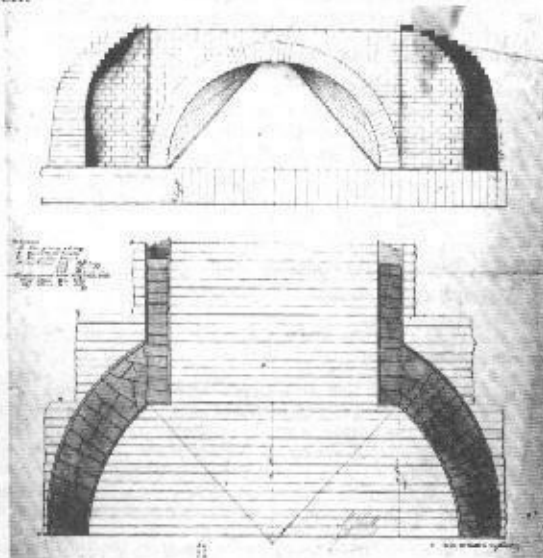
"CULVERT 24 FEET CHORD": DRAWINGS BY M.S. WEBB, WHITEWATER CANAL ENGINEER, CA 1839
